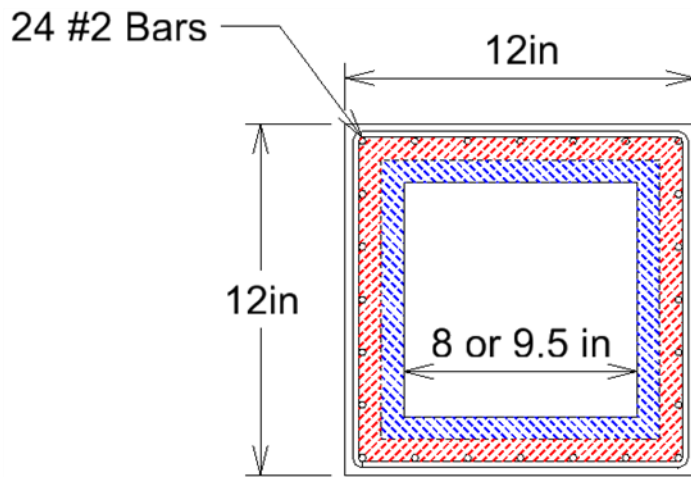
General Section Model for Tested Hollow Square Specimens
